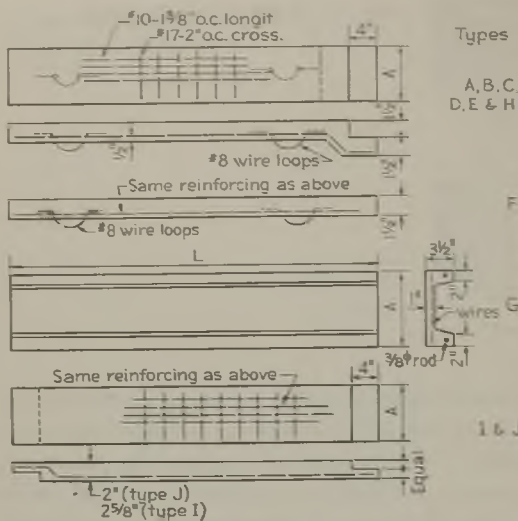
(a)—Precast concrete sheeting slabs—study for subway contract (see Table 2.)
